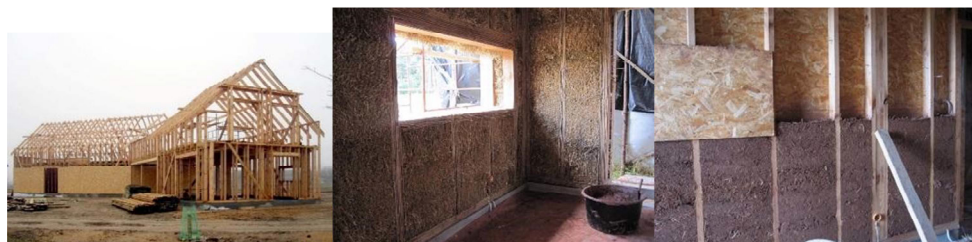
Construction of the “Dobry Dom” Straw bale building in Werstok. Construction of the wooden with connector plates, straw bales being laid before clay plastering, a wall constructed from light clay compacted into shoring. Photos: KamilSyller.
